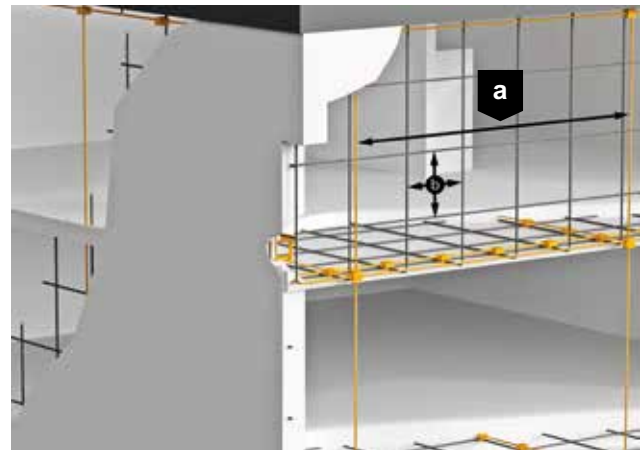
Example: use of reinforced concrete supports/down-conductor system
